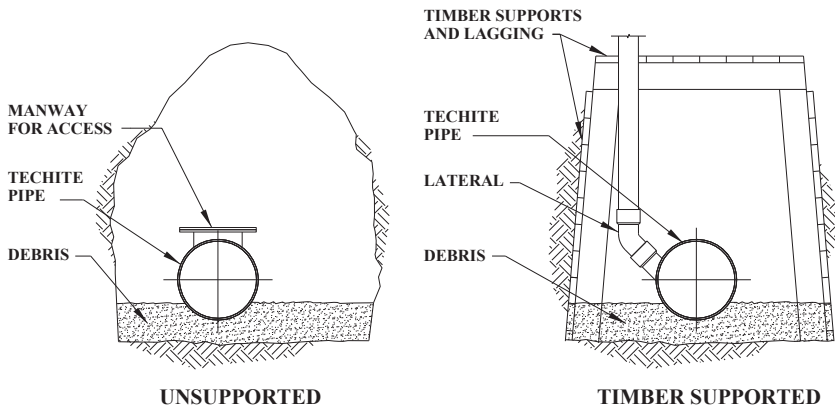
Typical Cross Sections of Unsupported and Timber Supported Tunnel
